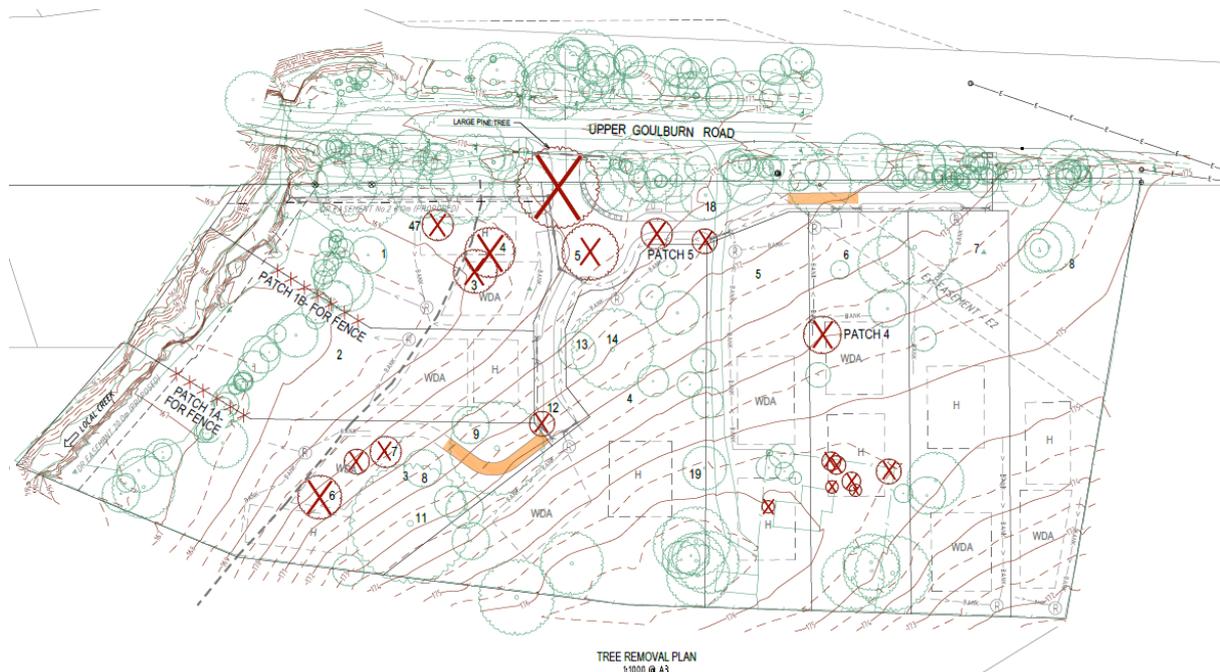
Tree Removal Plan of the proposal (Source - PGA, 2021)
